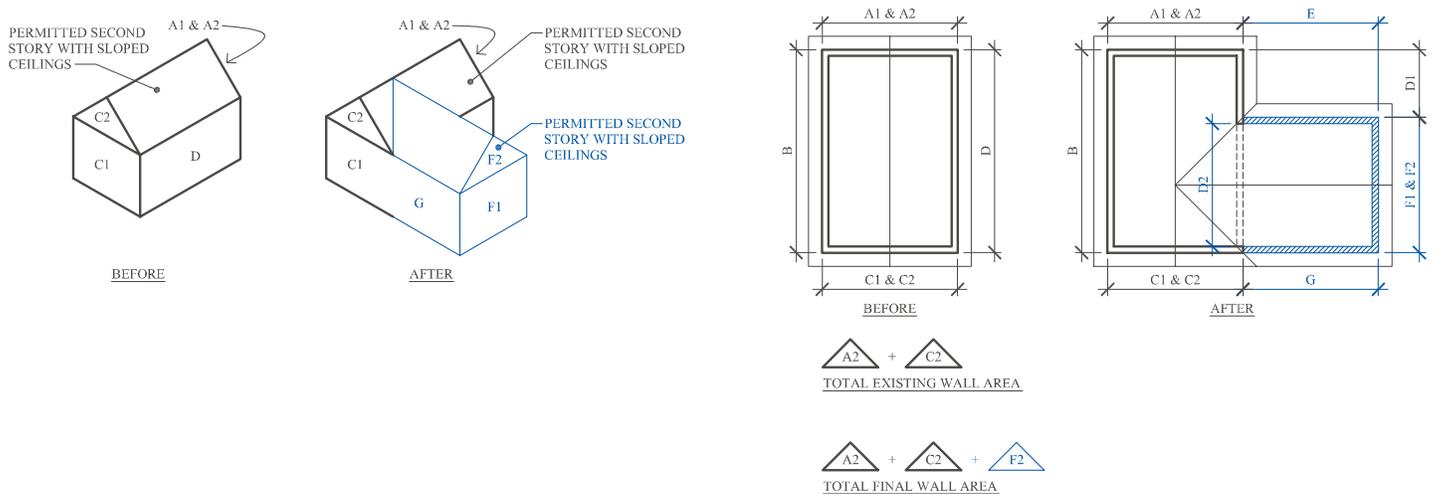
Wall area calculations for a house addition with unfinished attic
